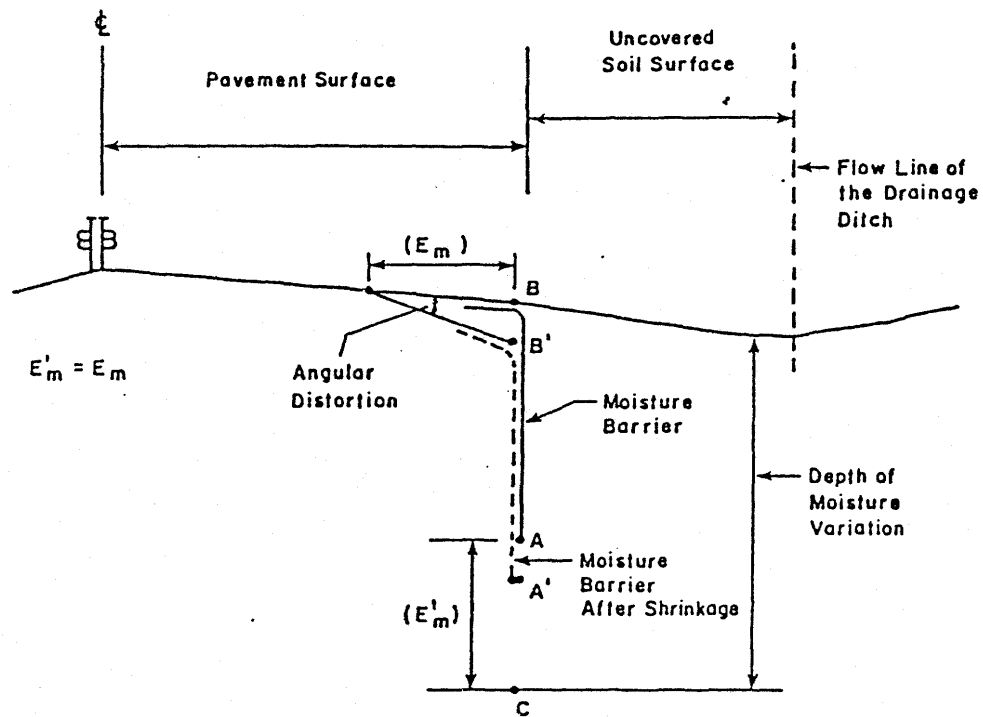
Installation of a vertical moisture barrier along the edge of a highway pavement (after Picornell, 1985).
